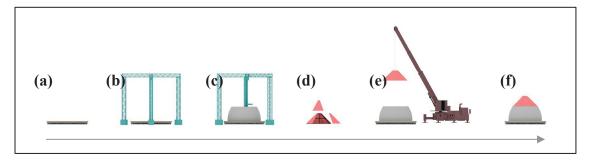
Sequential construction process. (a), base setup. (b), frame assembly. (c), 3D printing the structure. (d), assembling the prefabricated components. (e), installing the assembled structure. (f), final house
